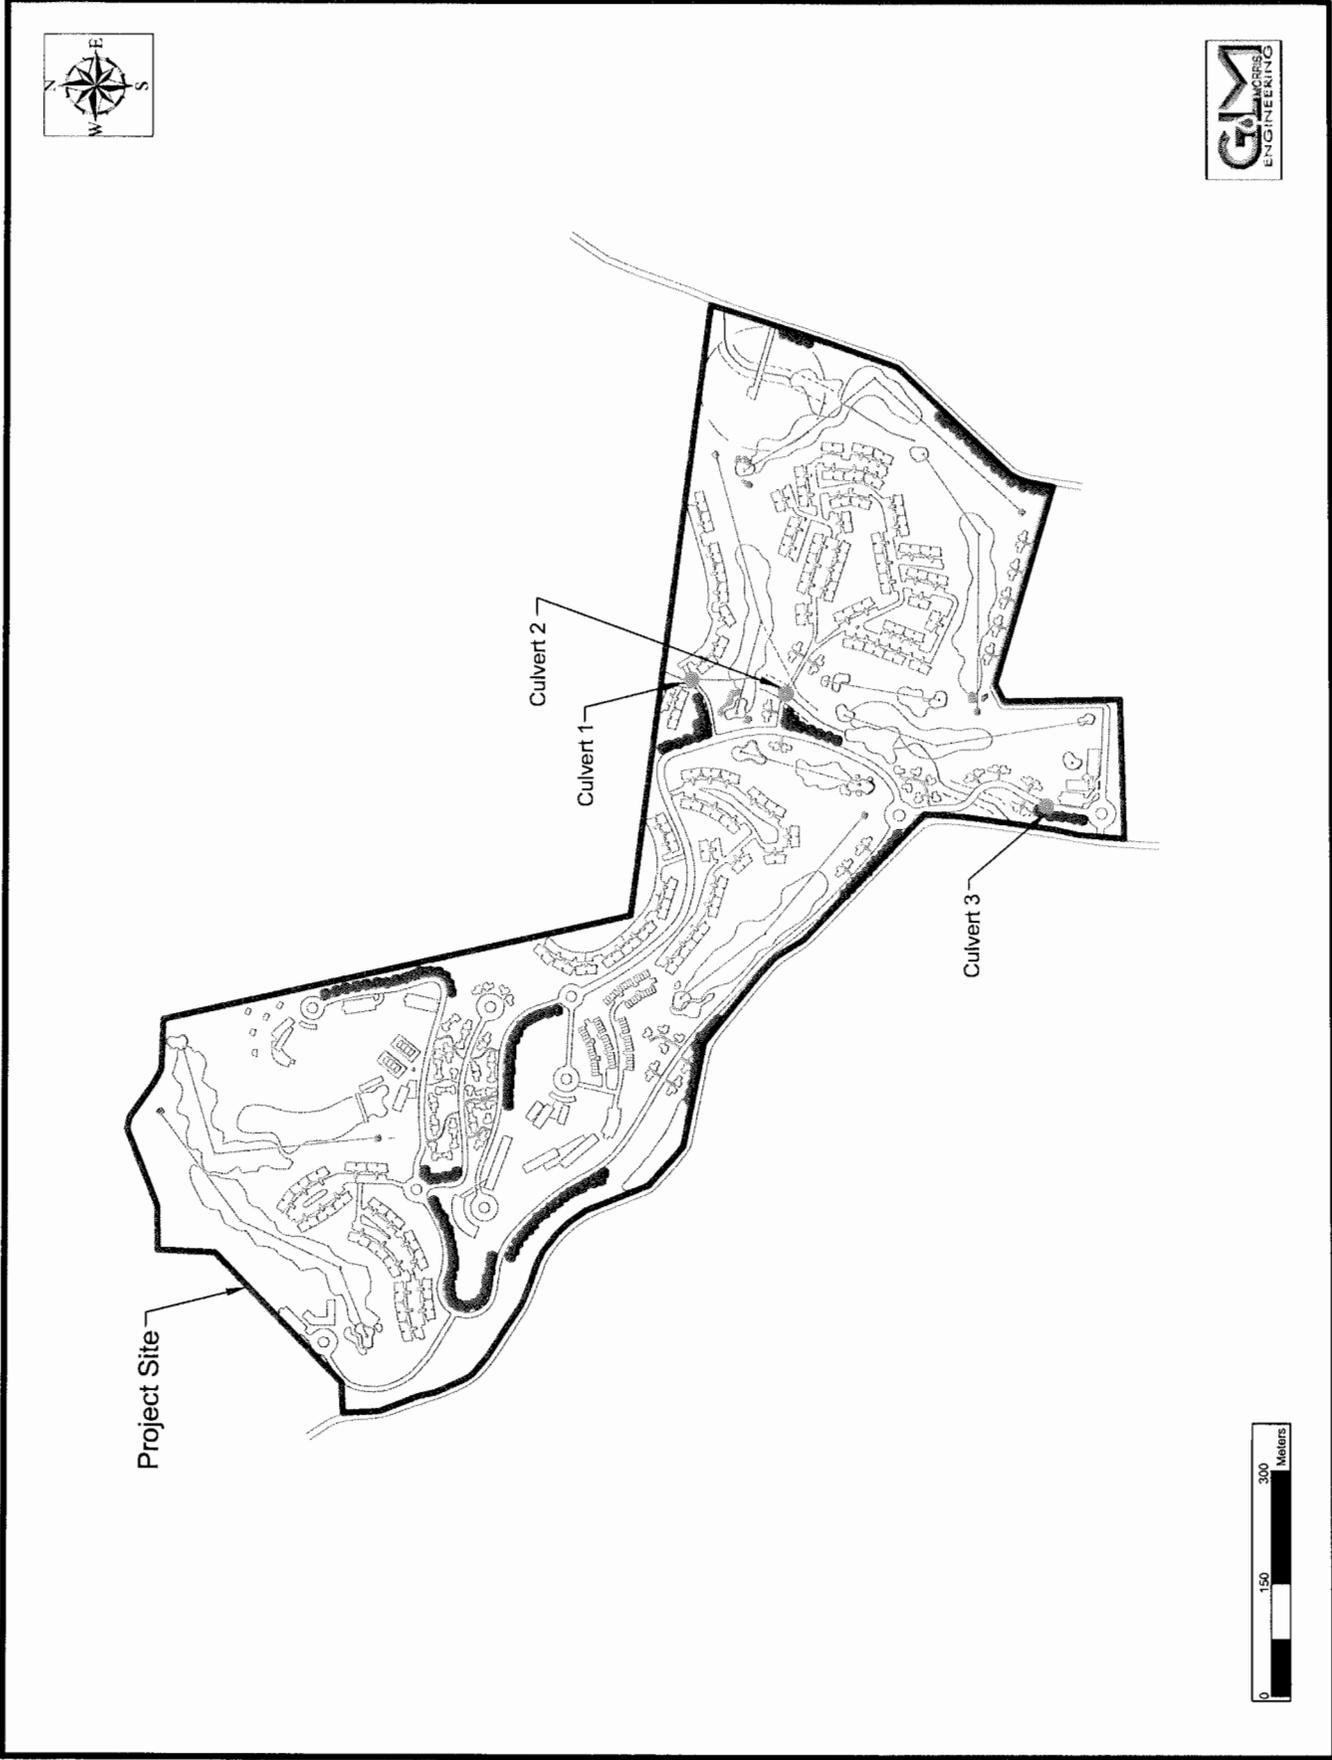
Location of proposed culverts crossing (scale 1:10,000)
